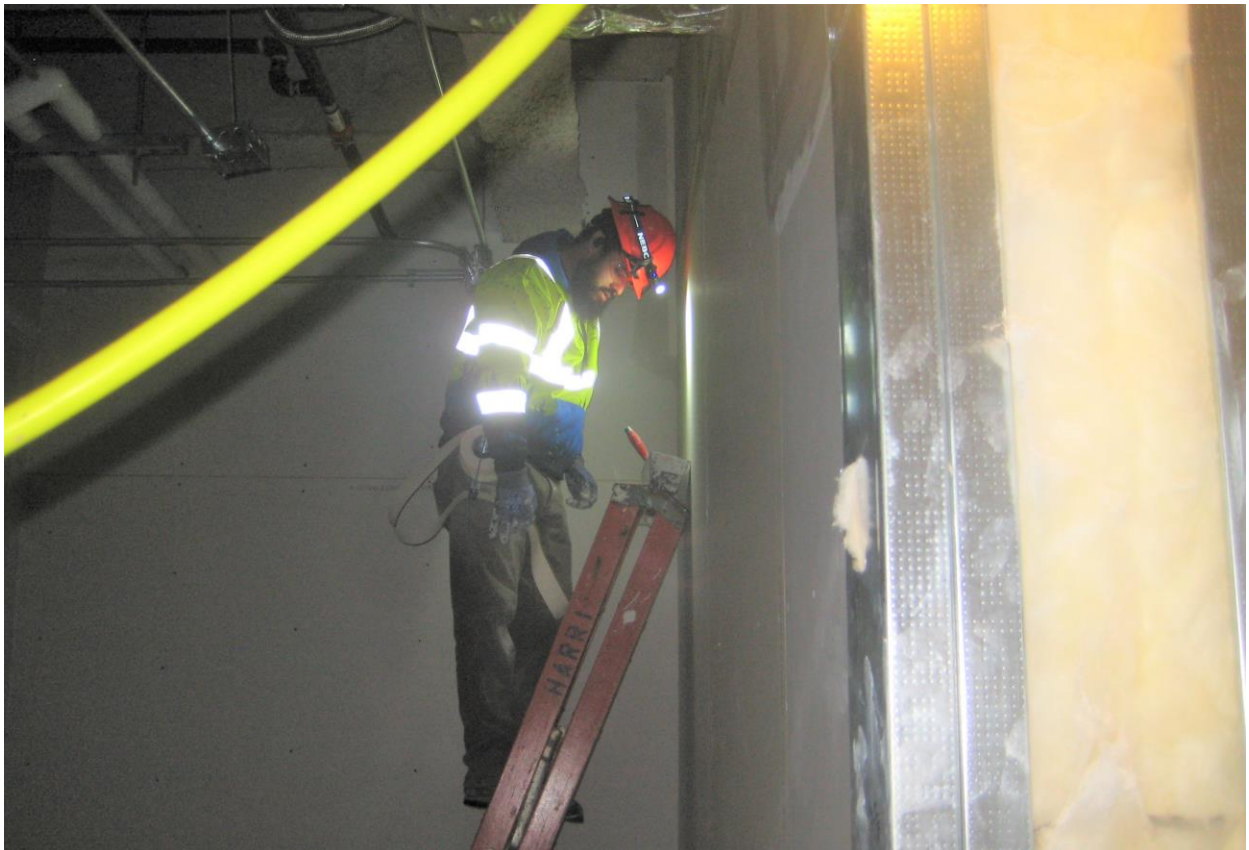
CC drywall worker, Mike, applies tape and mud to the upper portions of the interior walls within a room on the second floor level level.
